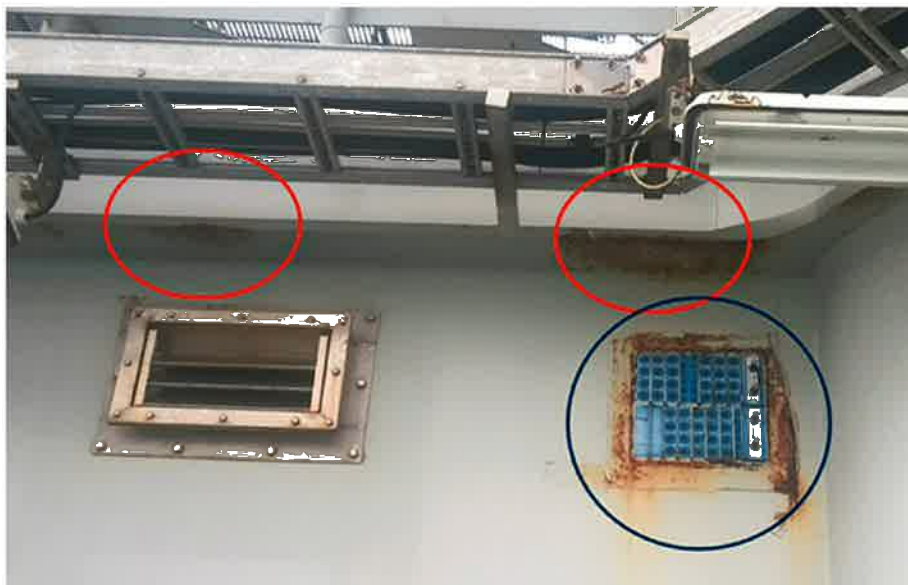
This image shows an offshore transformer station. Two typical faults in the surface treatment process that initiate corrosion attacks are noted. The red circles show the lack of rounding of edges (chamfering) on part of the steel bar. The blue circle shows a poorly mounted and painted light accessory after installation of the station. The intact ventilation duct on the left side of the photo has been mounted correctly during the manufacture of the station. *Photo courtesy of Dong Energy
